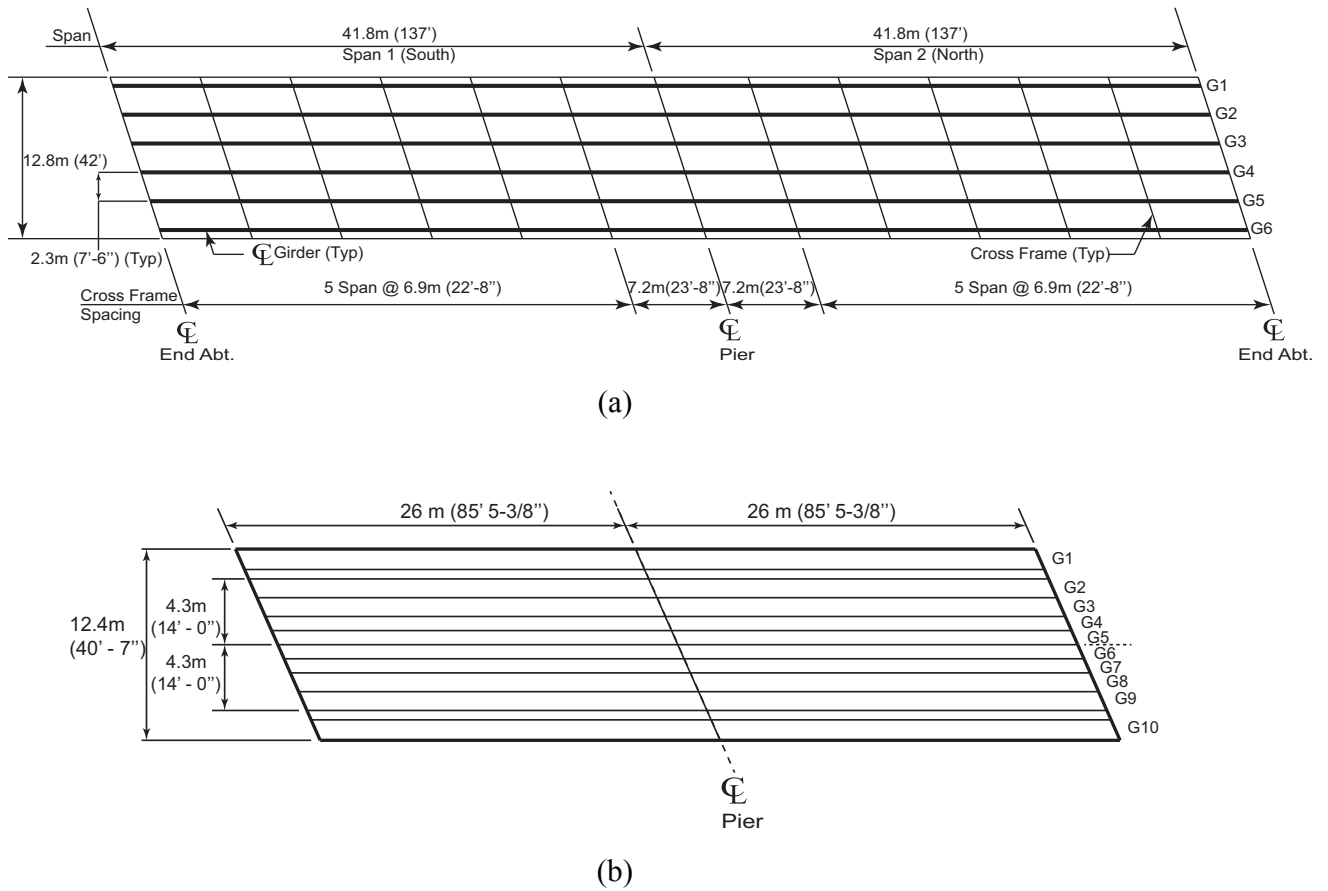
Pilot bridge plan views for (a) Virginia and (b) New York
